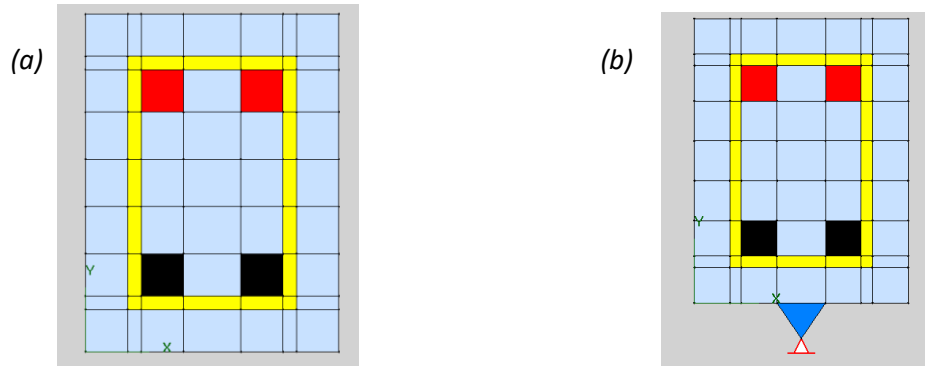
Sectional view for specimen VT50, 1 and VT100, 1
